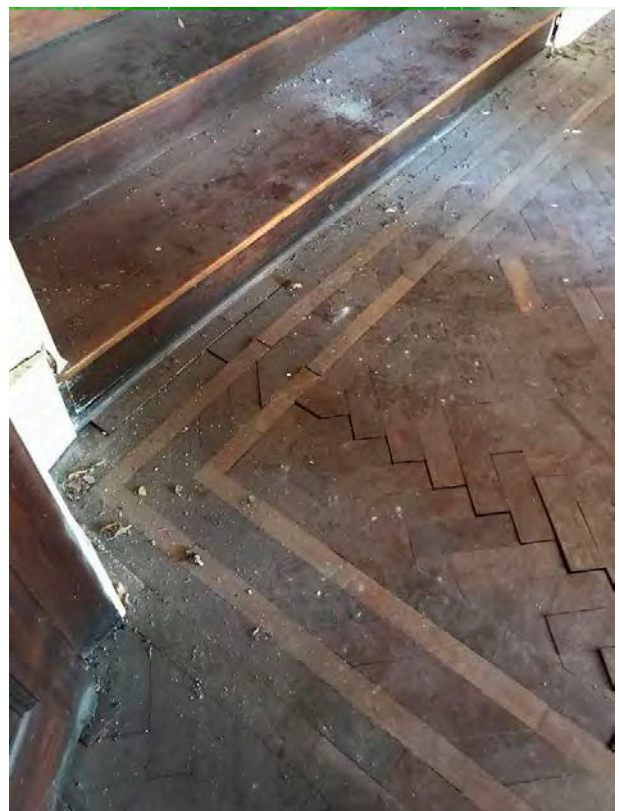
Cracking of masonry and floors of double-storey wing
